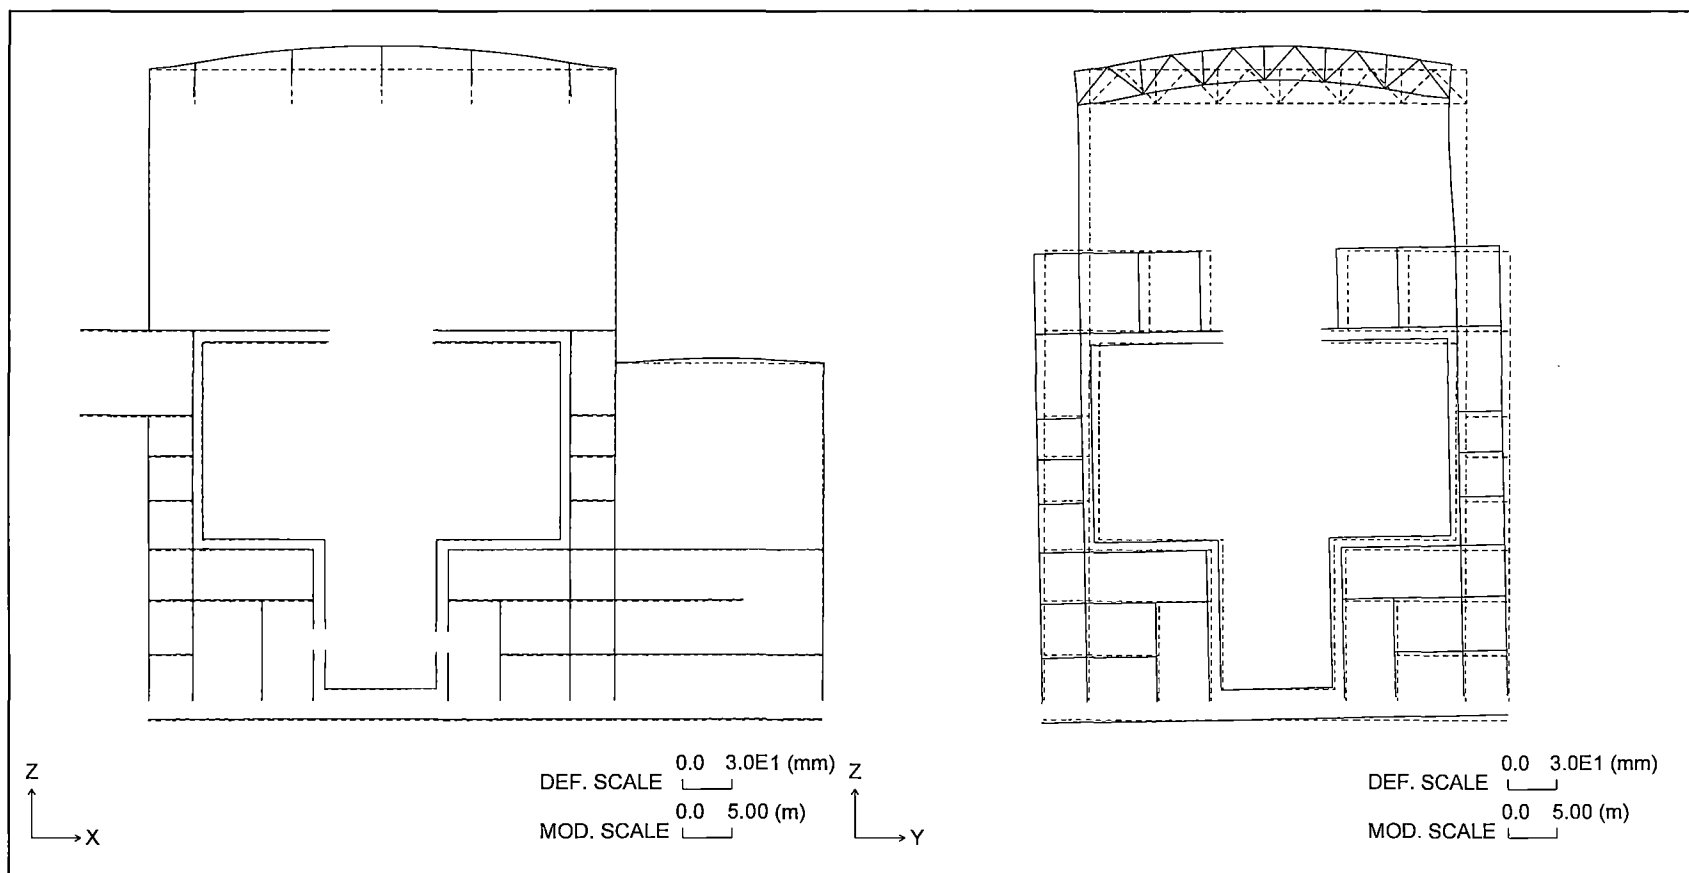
Section Deformation for Tornado Load (East Wind)
